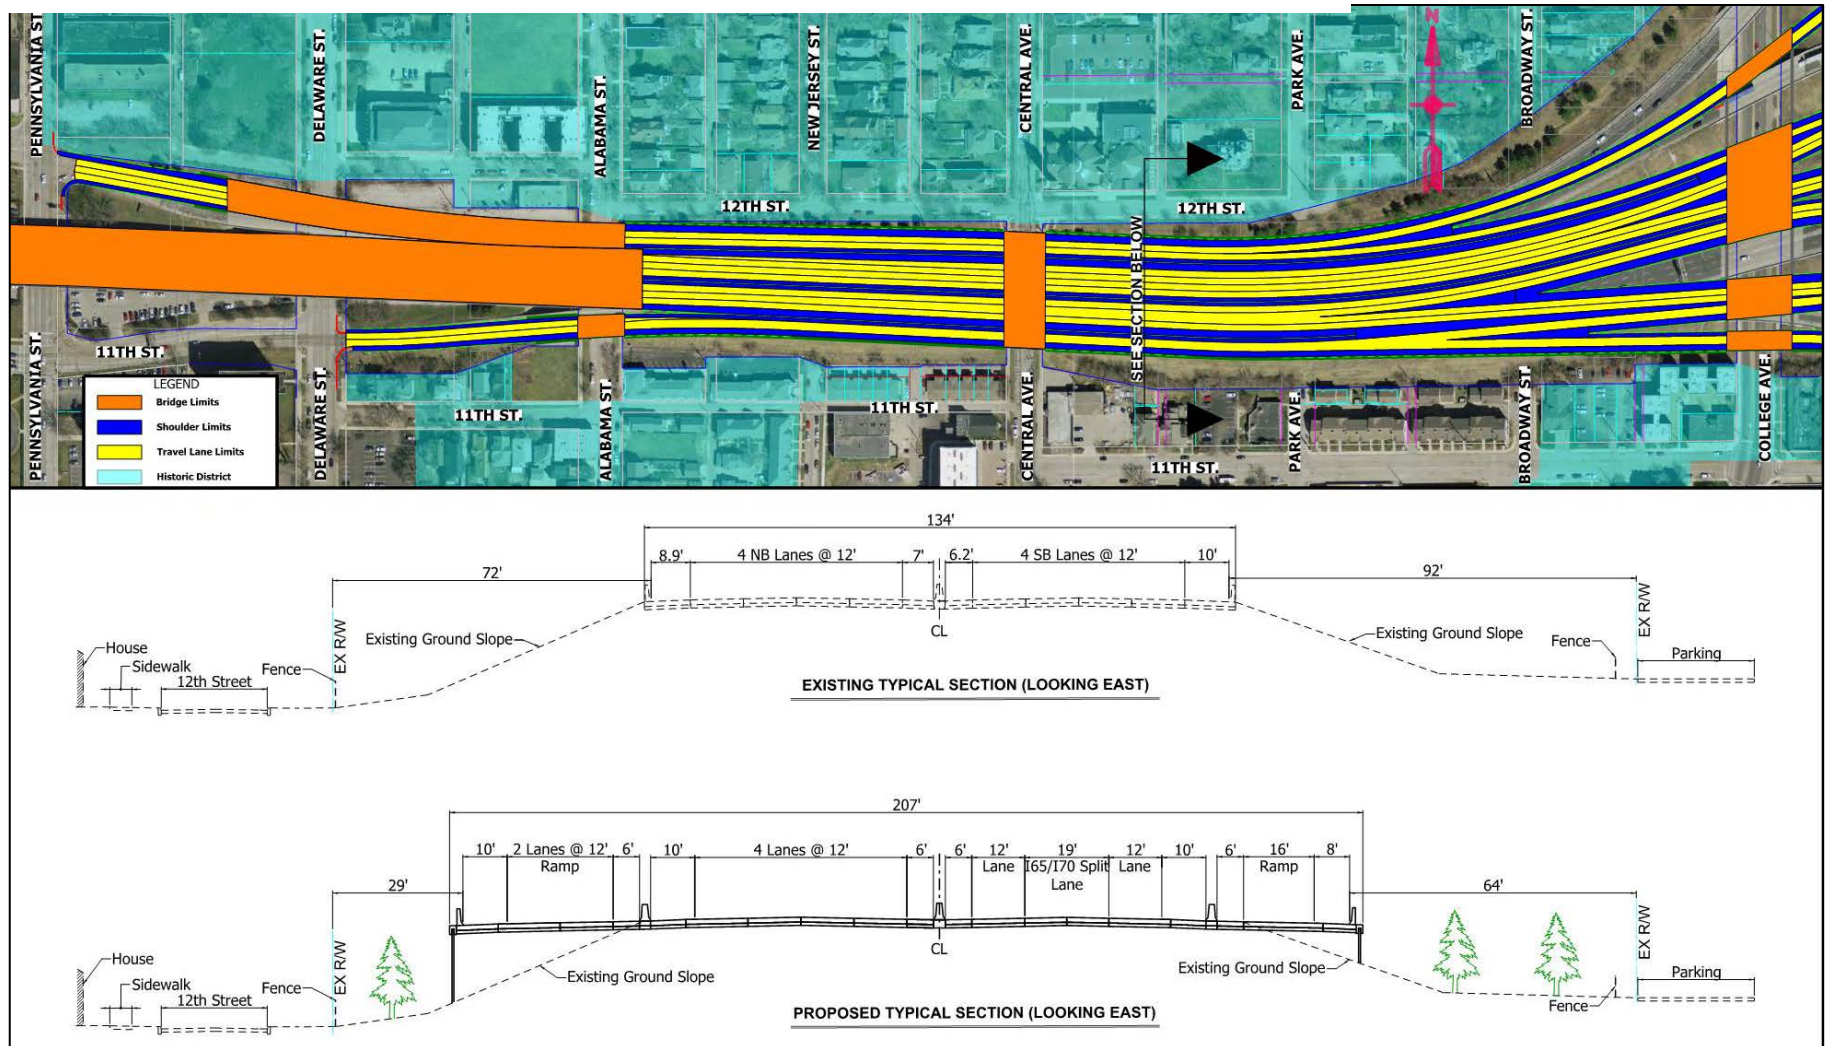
Alternative 4b - Cross Section at Central Avenue
